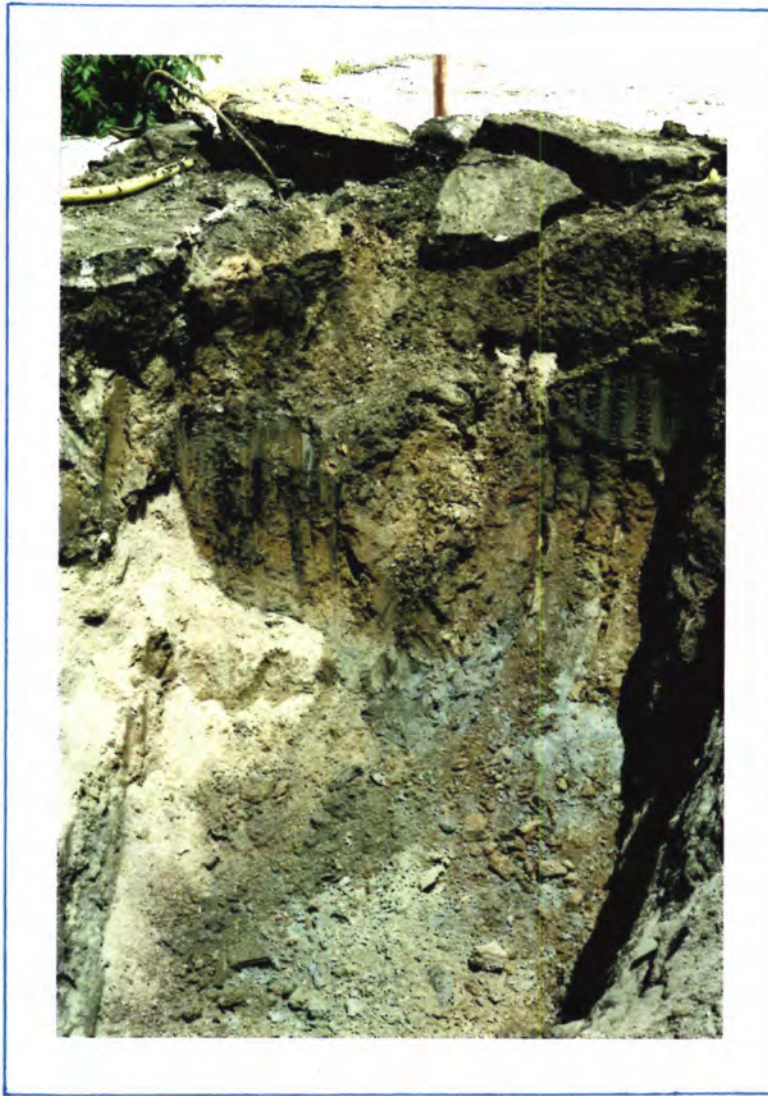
East end of the excavation near the dispenser. Contaminated soils are shown prior to over-excavation.
